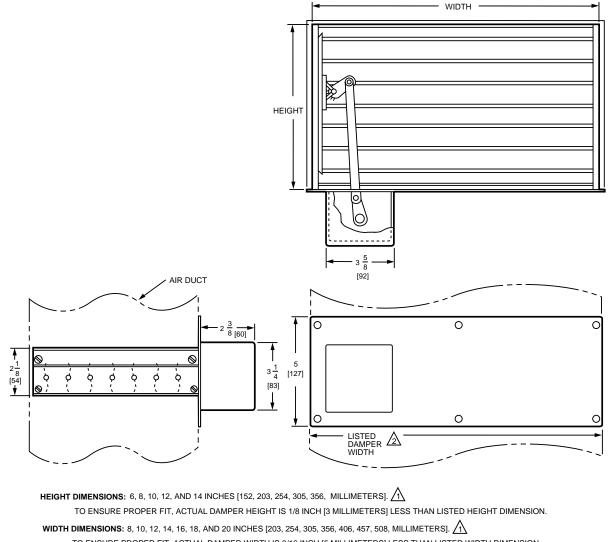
Automatic opposed blade damper-bottom mount dimensions.
